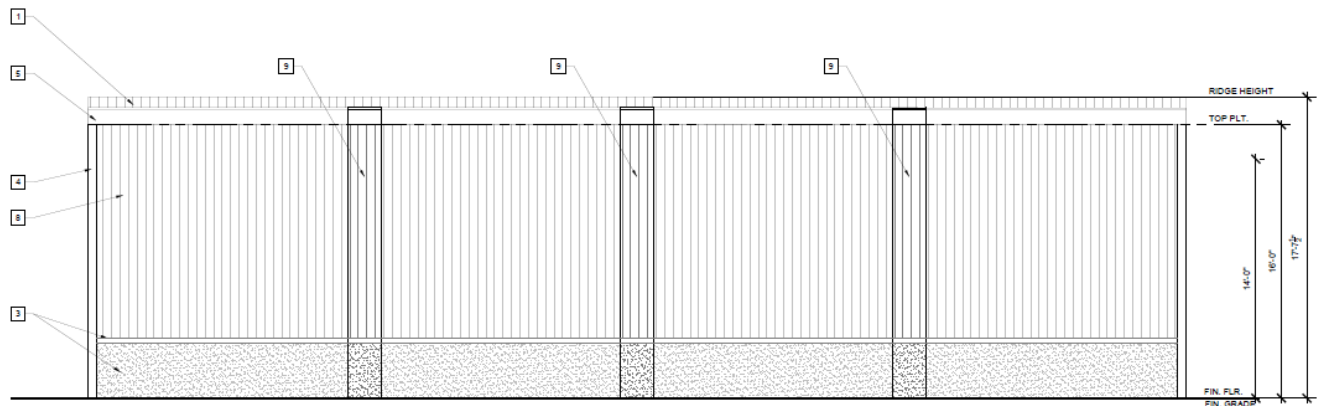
Building Elevations- Typical Storage Building (*full size sheets in application package*)
